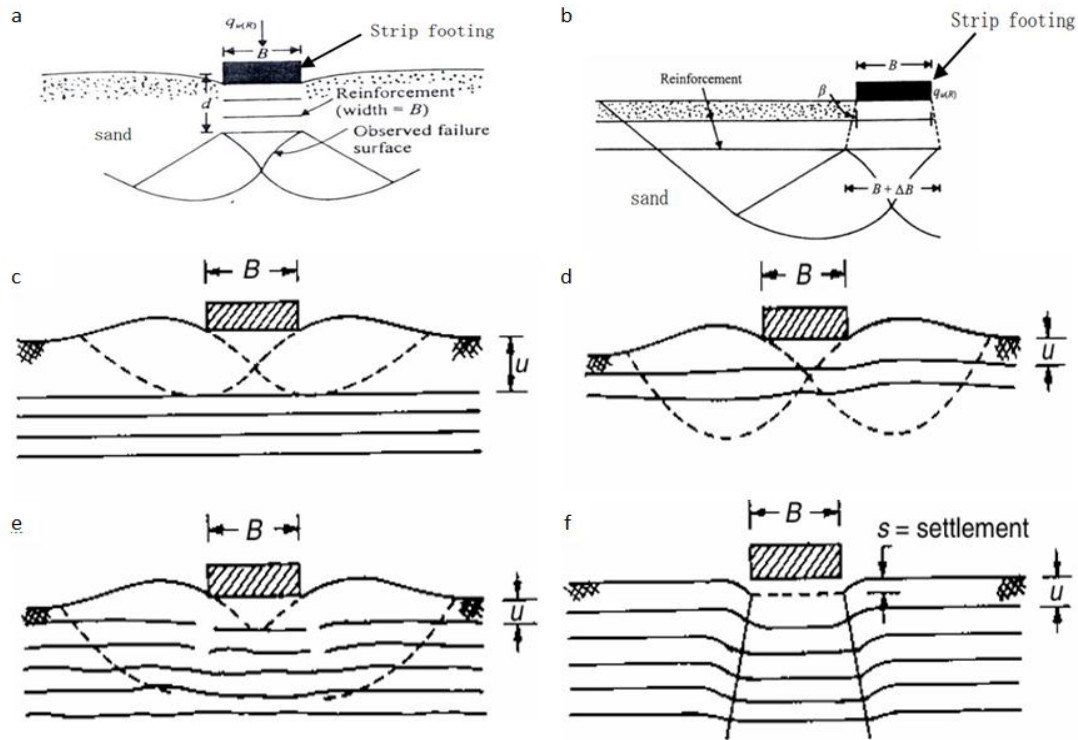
Different Types of Failure of Reinforced Soil (a) Deep Foundation, (b) Wide Slab, (c) Bearing Capacity, (d) Pull-Out Failure, (e) Breaking of Reinforcement, and (f) Creep Failure [16].
